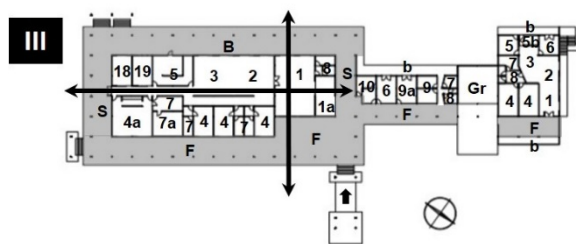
Wisma Yaso's third plan (1963-1964)⁴⁾
